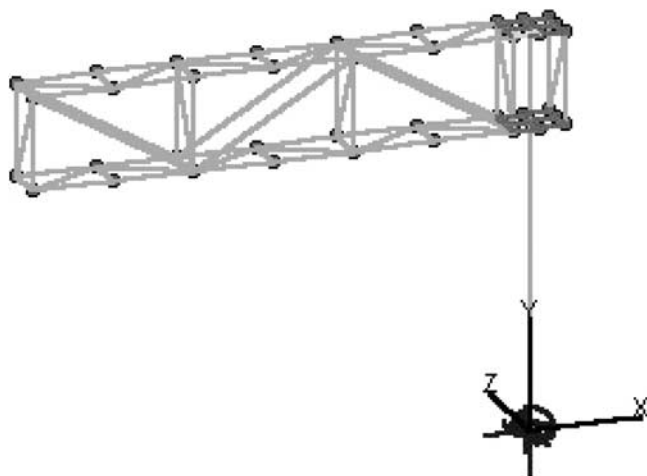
Finite element model of IDOT box-truss VMS structure.
